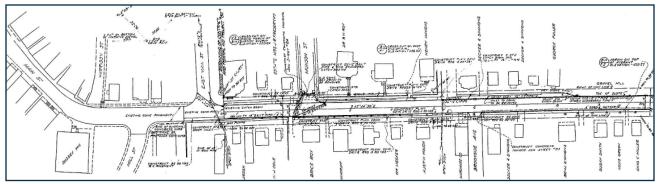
Plan of improvements from stations 0+00 to 10+00 in Sussex.
